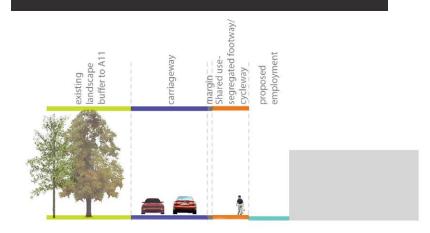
INDICATIVE ACCESS ROAD SECTION
